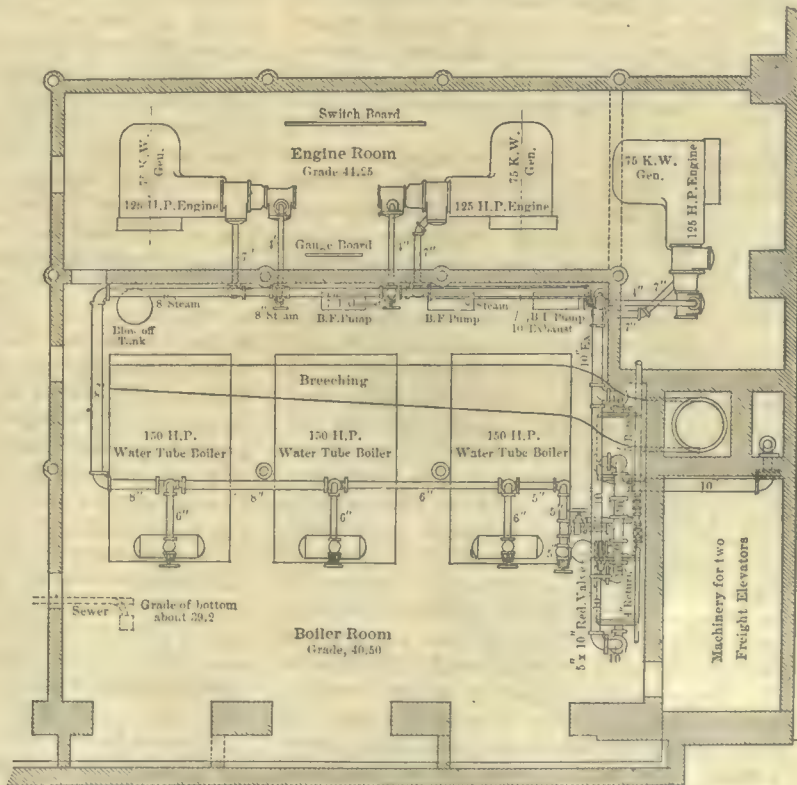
SECTION OF BOILER AND ENGINE ROOM.
